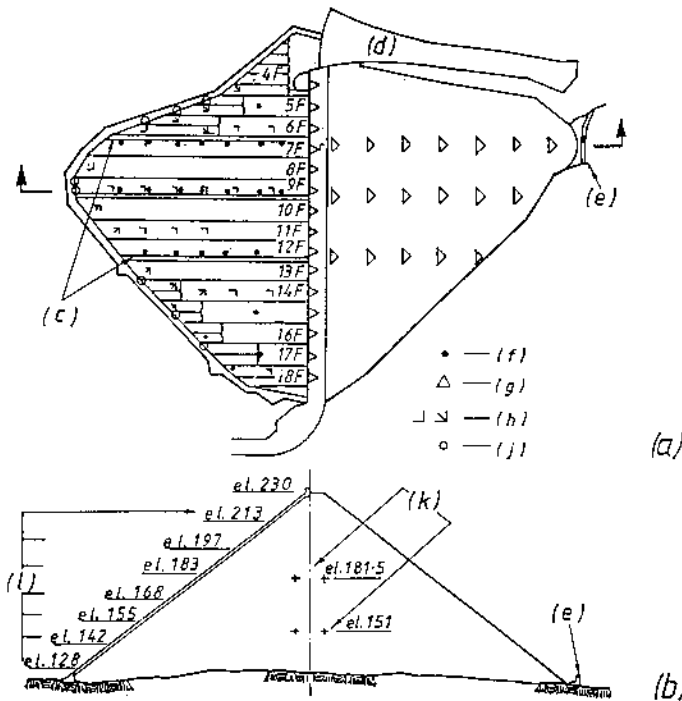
Monitoring for Cethana concrete face rockfill dam (ICOLD 1989). a) Plan view. b) Cross section. c) Inclinometer pipes. d) Spillway. e) Leakage weir. f) Anchor points for wires. g) Survey targets. h) Strain gauges. j) Perimetric joint meters. k) Hydrostatic settlement cell. l) Installation level of strain gauges.
